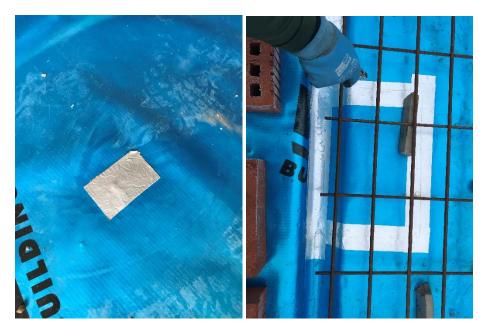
Options for patching a hole: Left - gas proof detail tape used to cover the hole. Right – a piece of membrane is stuck over the hole using double-sided tape on all sides.
